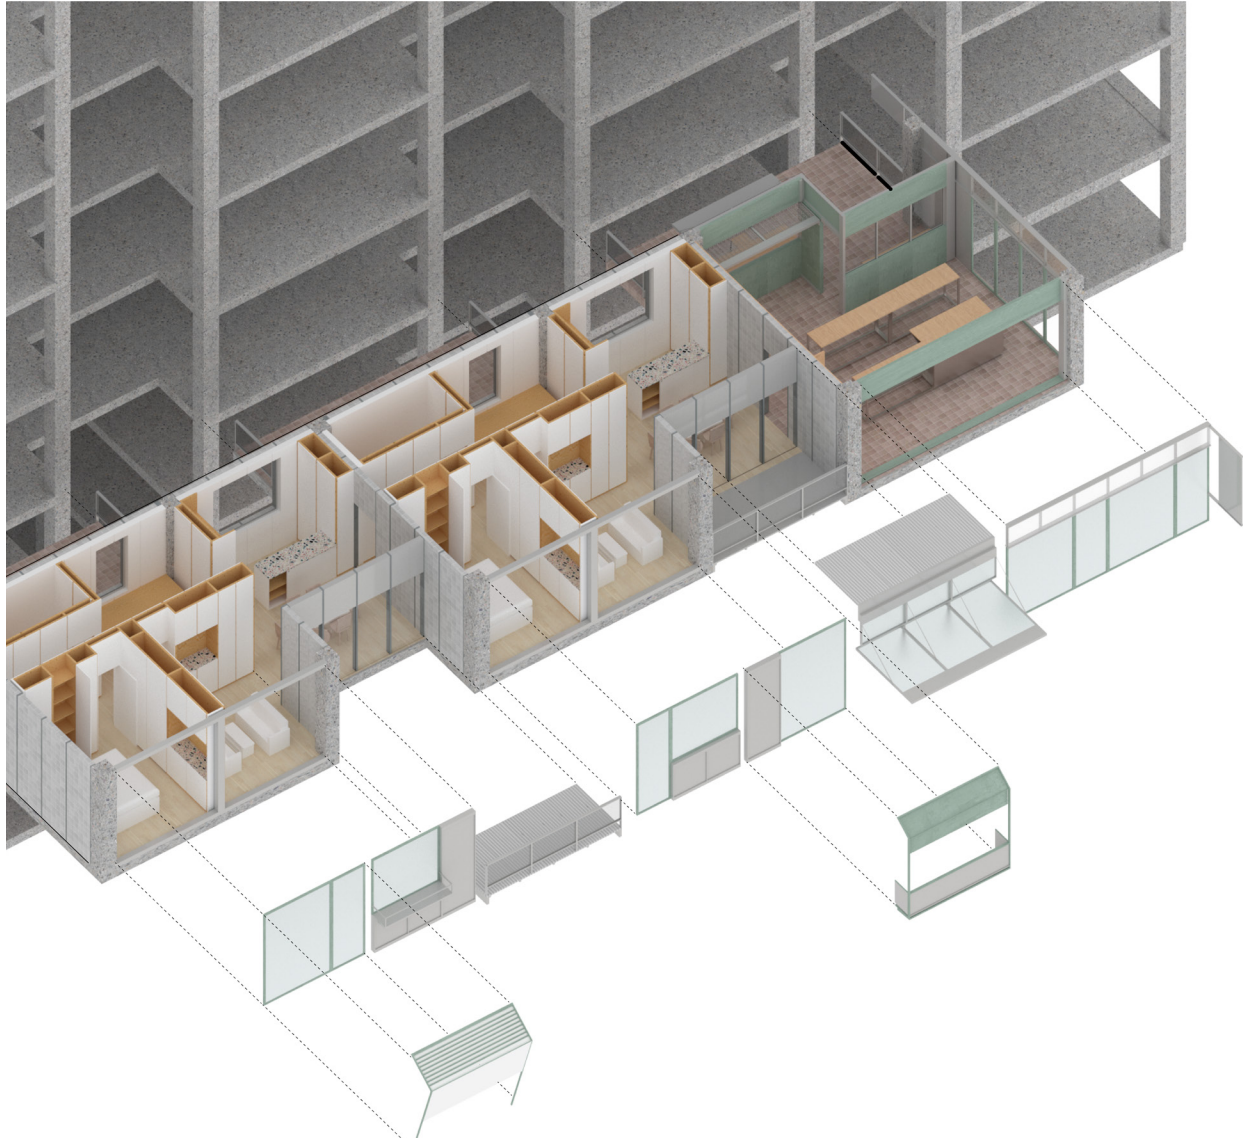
Exploded view showing the different panel assemblies that can be used to construct the street-facing facade of the courtyard units.
